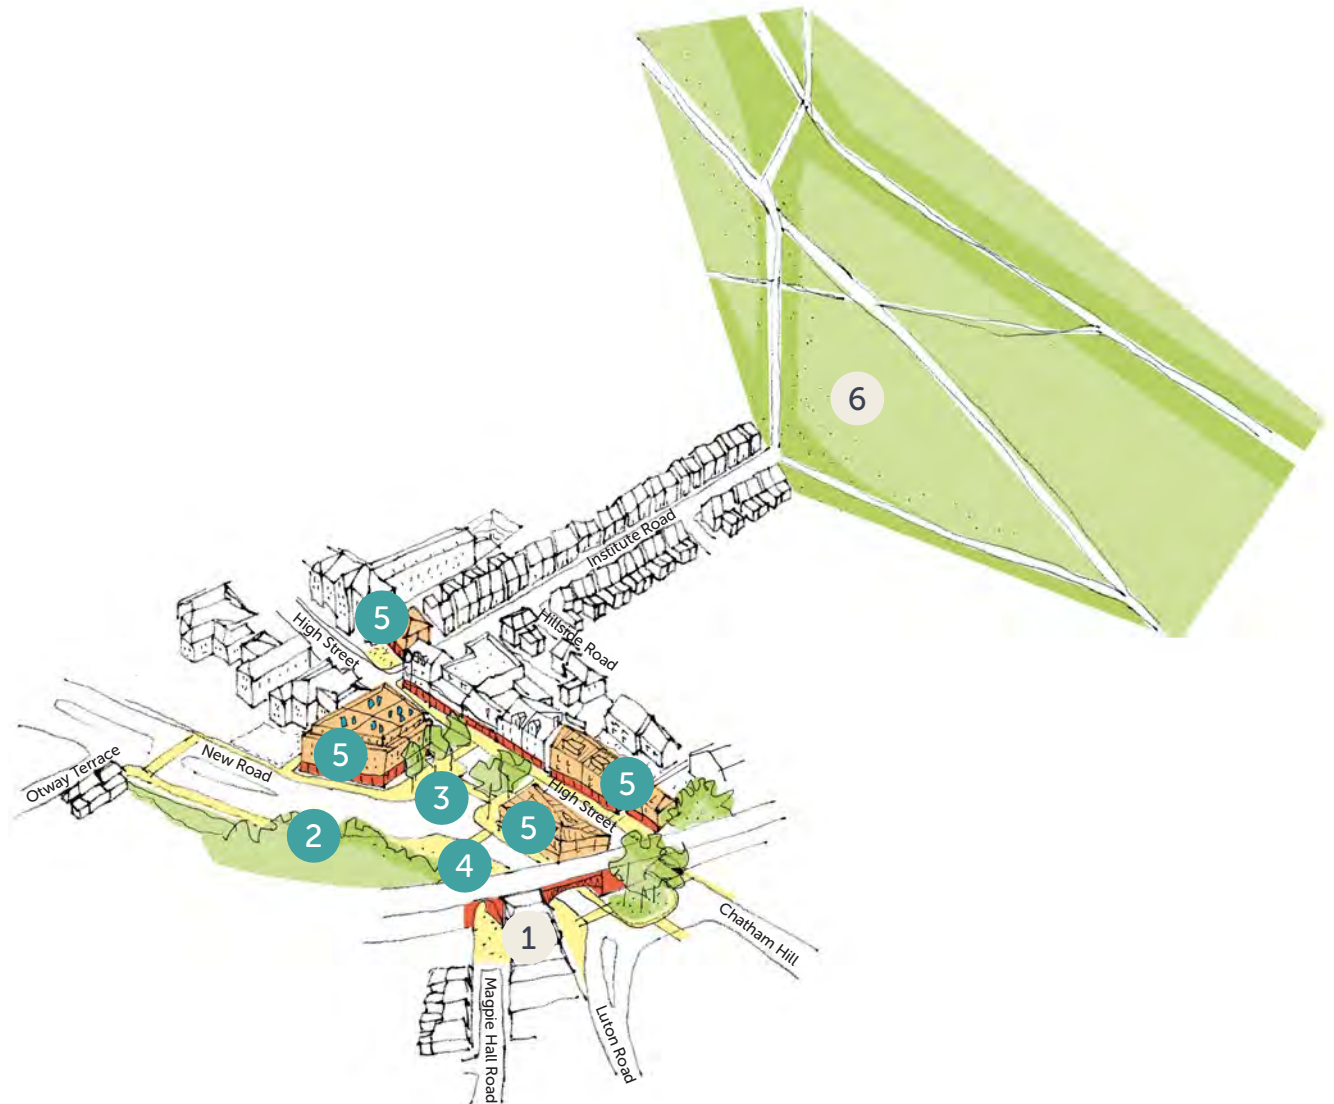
Built Form Parameter Plan | Masterplan Area 3 0m 100m
